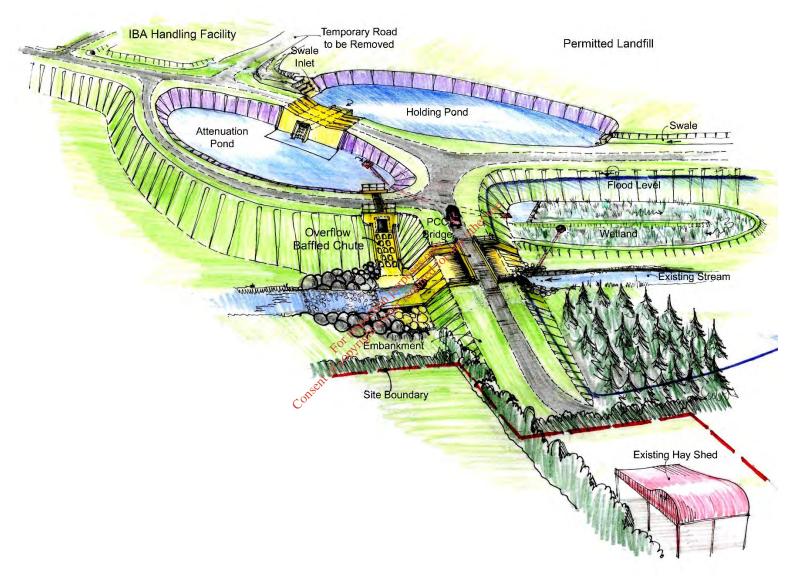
Artist Impression Northern Stormwater Attenuation Pond and New Flood Area
